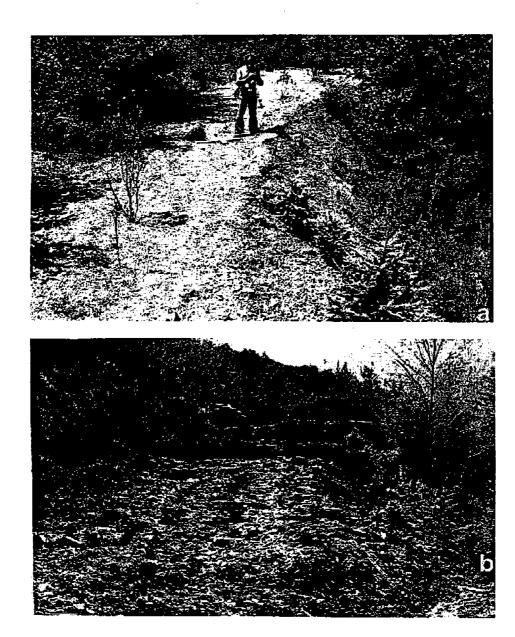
An example of the least intensive road rehabilitation technique. a) Abandoned logging road before treatment. b) The road surface is decompacted, and ditches are constructed perpendicular to the road alignment to drain the road. The road bench and road fill remain in place.
